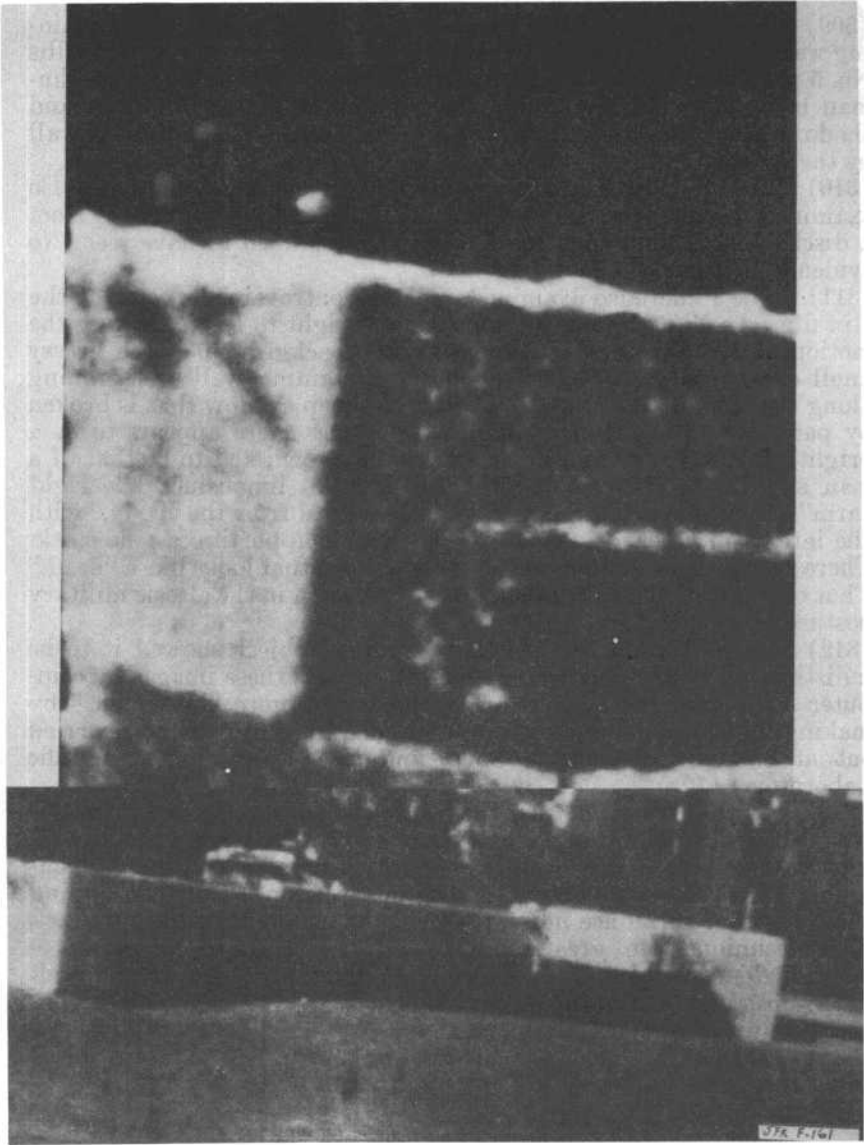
Retaining wall image (Nix film) Top: Enhanced. Bottom: Unenhanced.
